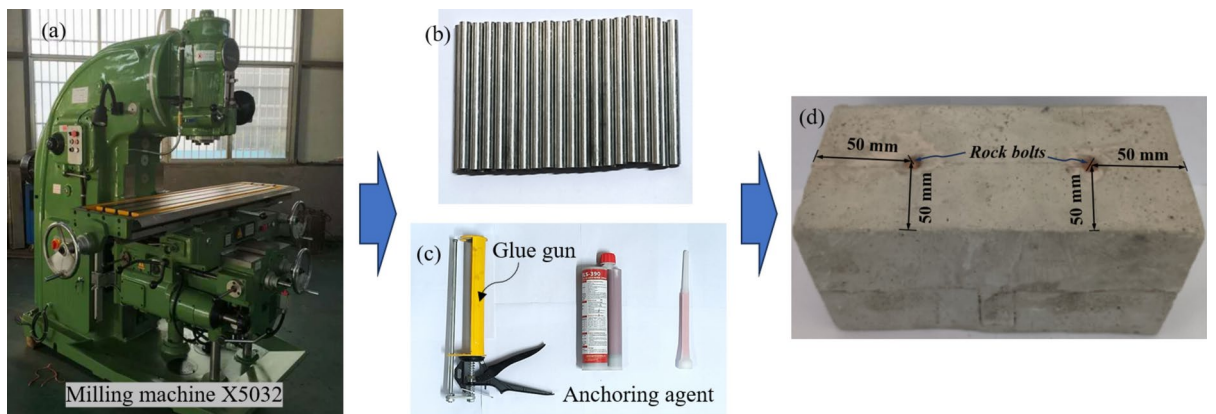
Installation of aluminum bolts: (a) Drilling hole by milling machine X5032; (b) Aluminum rods; (c) Anchoring agent; (d) Jointed model material specimen reinforced by aluminum bolts.
